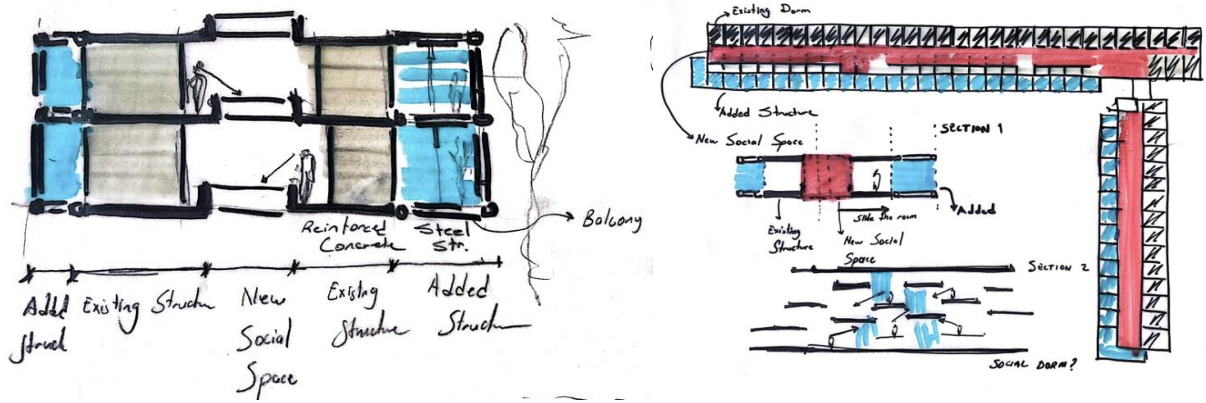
Plan and section sketches of design ideas for the reuse of historical dormitory blocks – preserving the traces of the existing structure and articulating with it (Sevindik, 2022)
